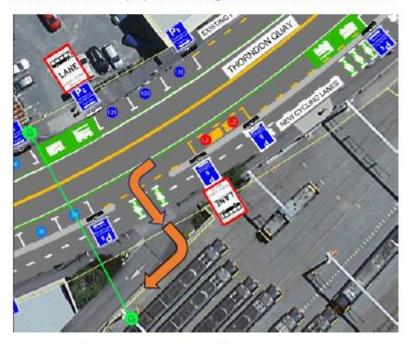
Excerpt from Plan 7, Designing for safe truck access
